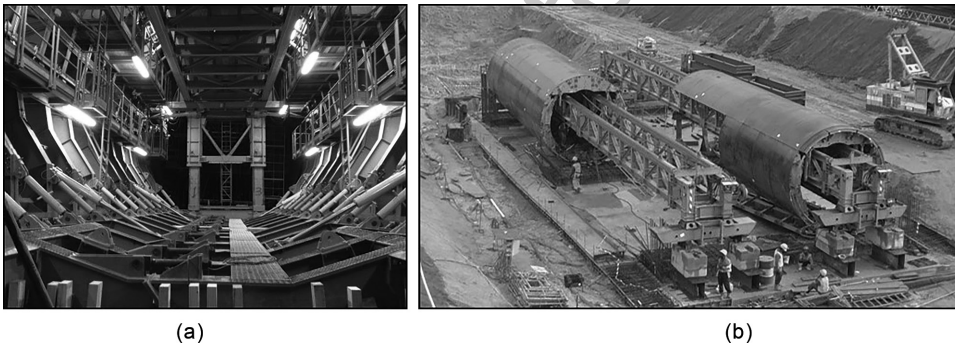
Formwork detail (a) and self-launching formwork (b).
